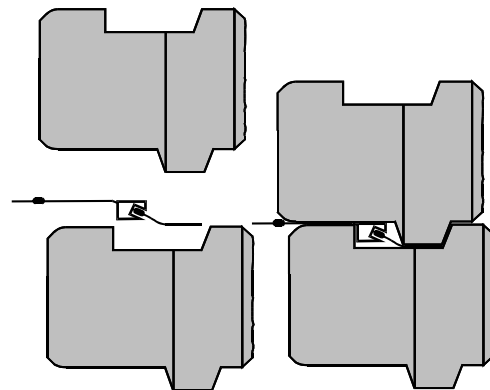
System drawing: Detail of the connection grid – modular concrete block (cross section)
